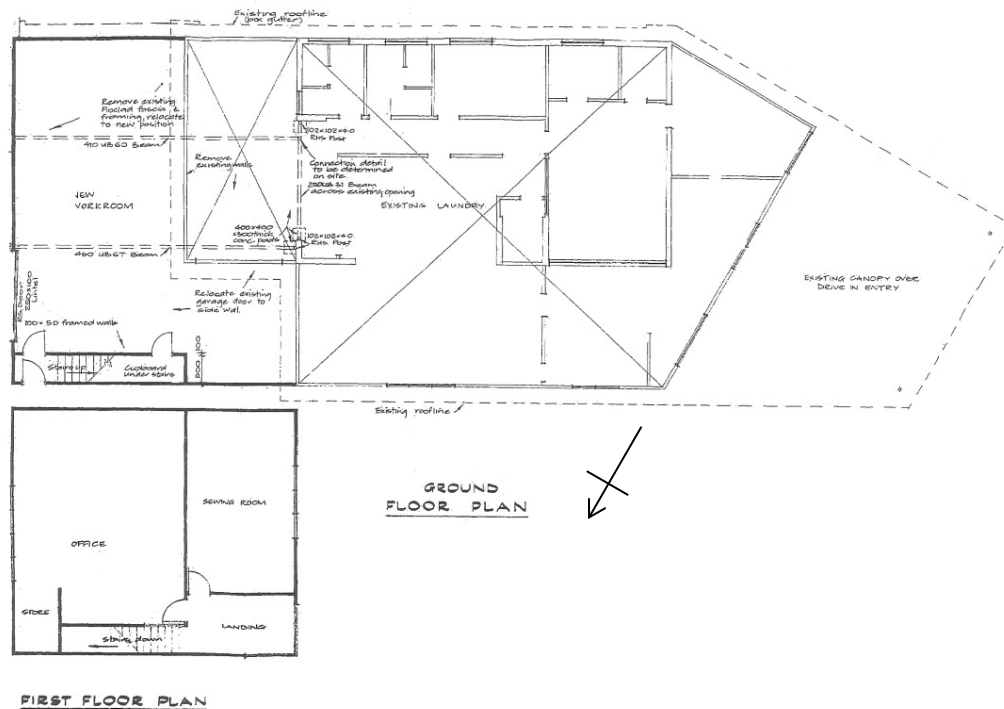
Floor plan (from 1988 permit drawings, not to scale)
